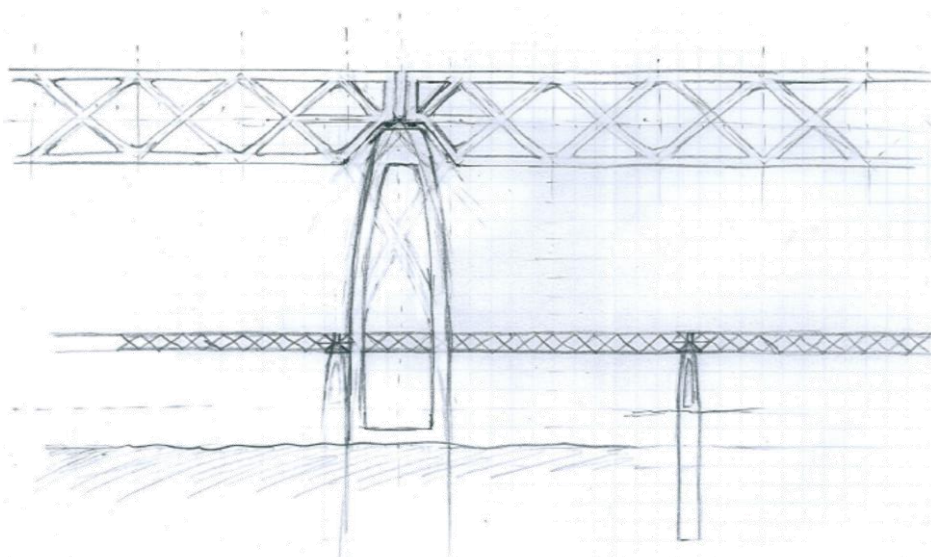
SUGGESTED LATTICE GIRDER BRIDGE WHICH IS SUPPORTED AT THE GIRDER AXIS
